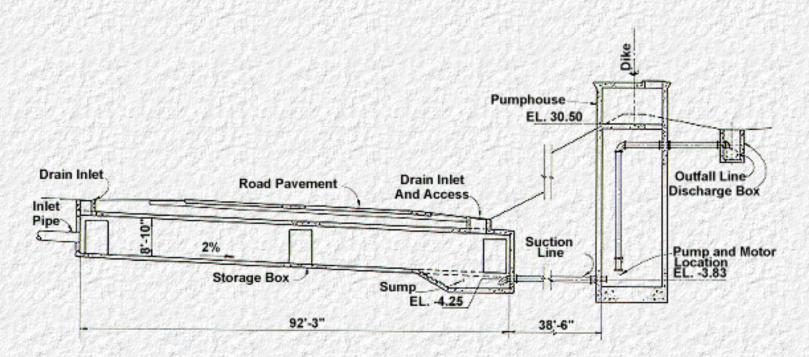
Section Through Storage Box and Dry-Pit Pump Station
